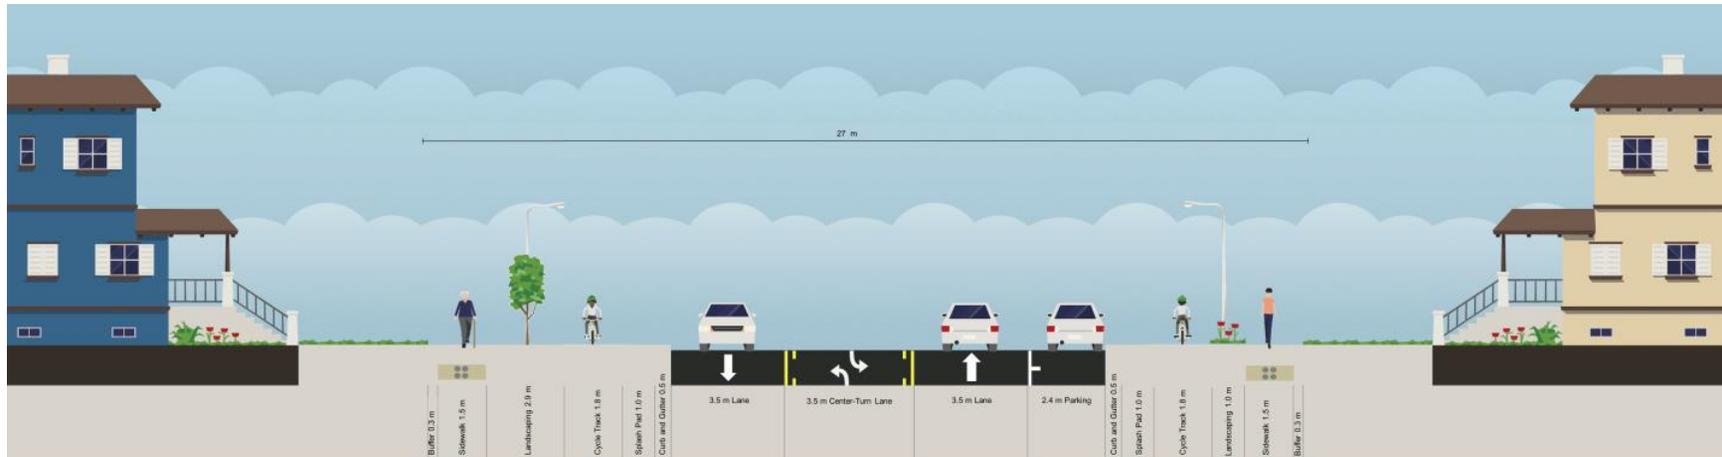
Area 2 Preferred Typical Cross-Section
